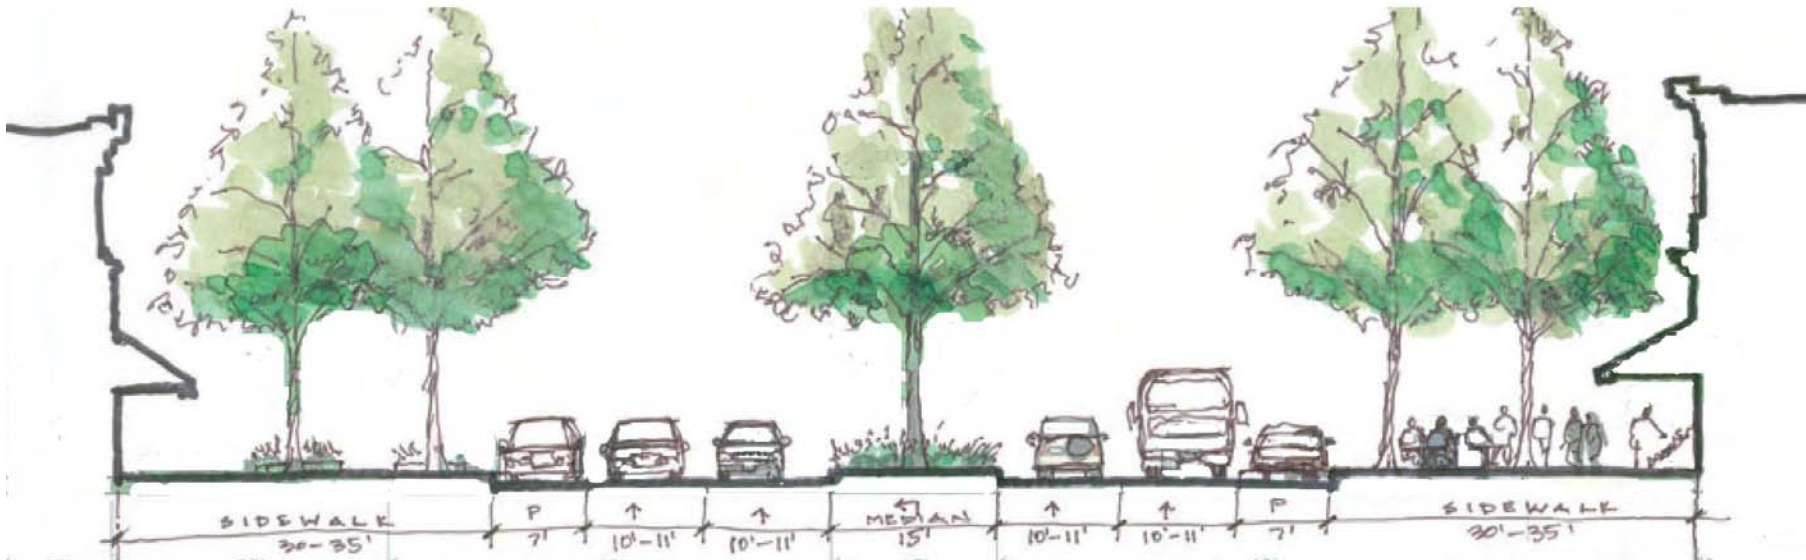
This cross section illustrates how the city could widen sidewalks, provide on-street parking, and support streets that balance travel modes.
